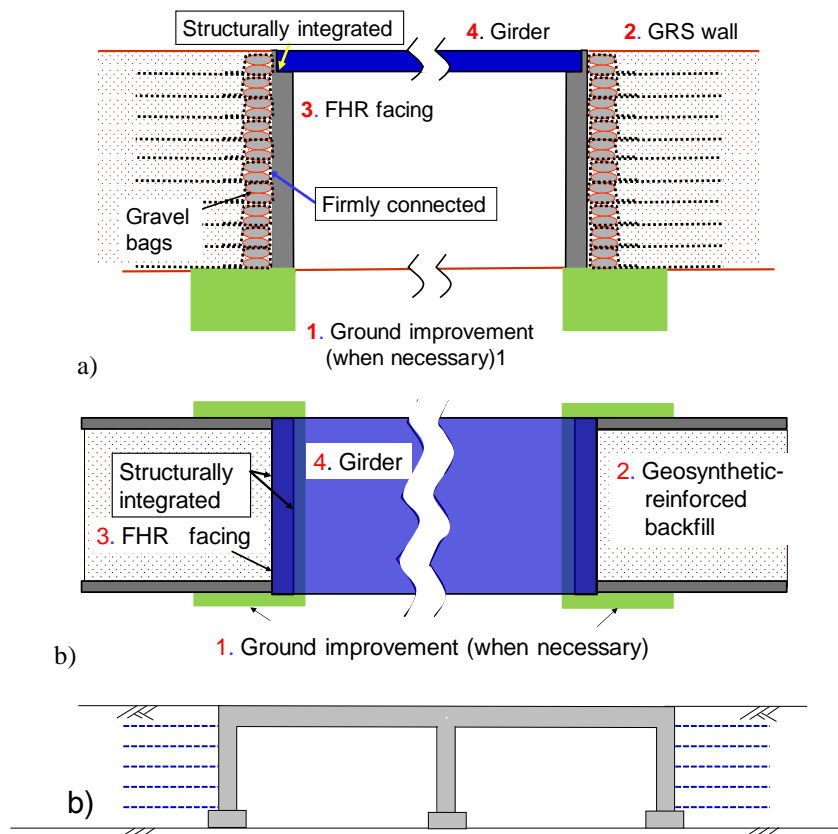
GRS integral bridge: a) elevation; and b) plan (the numbers show the construction sequence); and c) two-span GRS integral bridge
